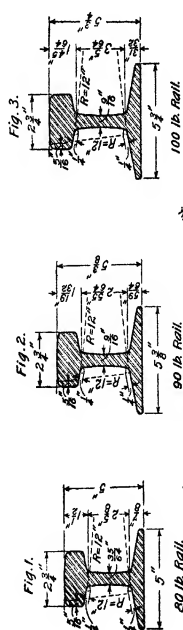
, TITLE: RAILROAD CONSTRUCTION
